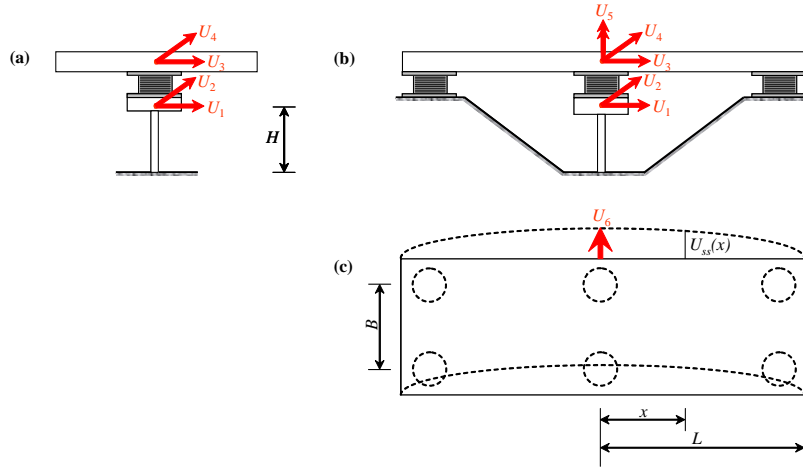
Bridge configurations for parametric studies. (a) Elevation for Configuration 1, (b) elevation for Configurations 2 & 3, and (c) plan for Configuration 3.
